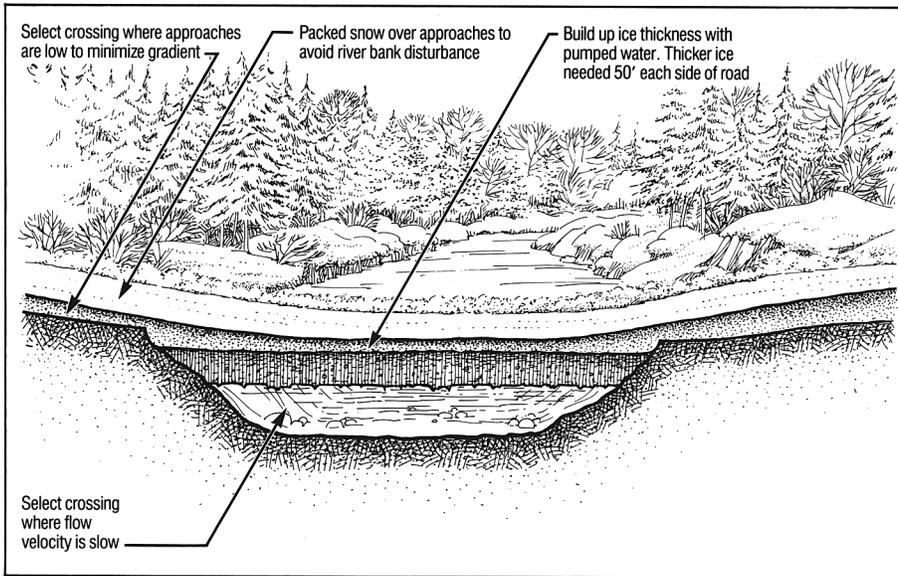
Details of ice bridge construction for temporary stream crossing in winter (Ontario MNR, 1990).
